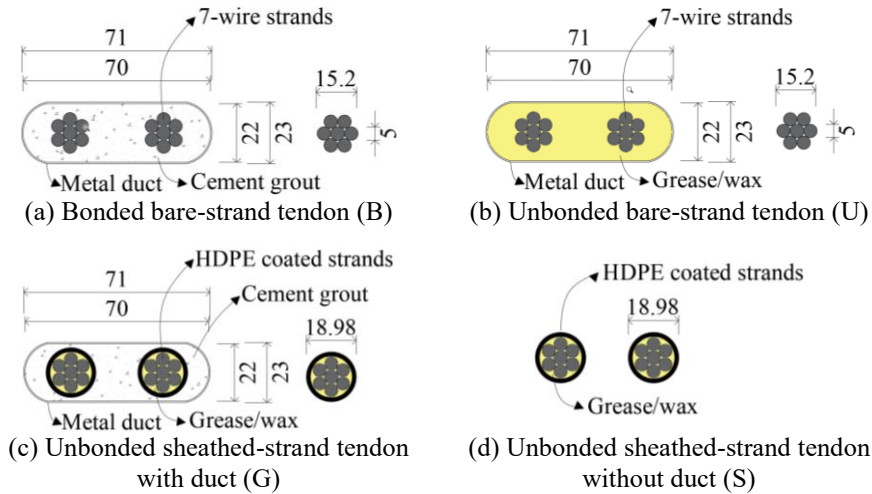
Tendon configuration installed in specimens (unit: mm)
